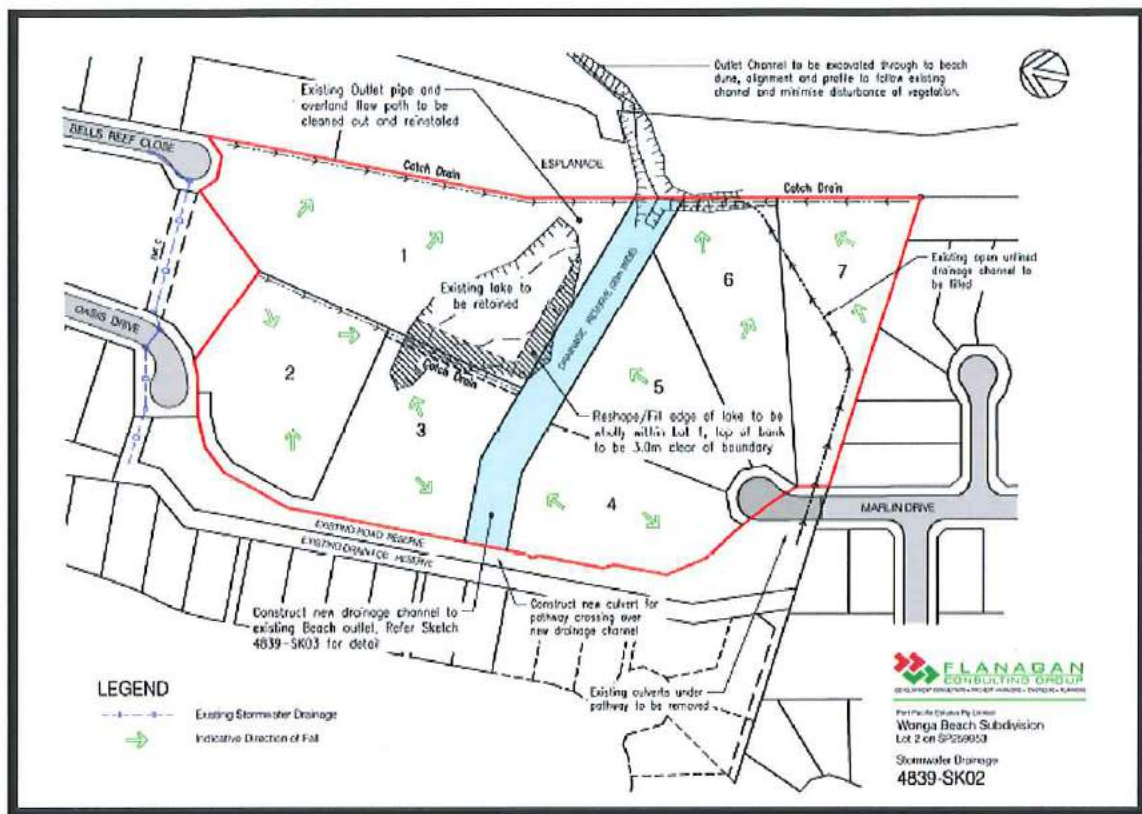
STORMWATER DRAINAGE (4839-SK02)
